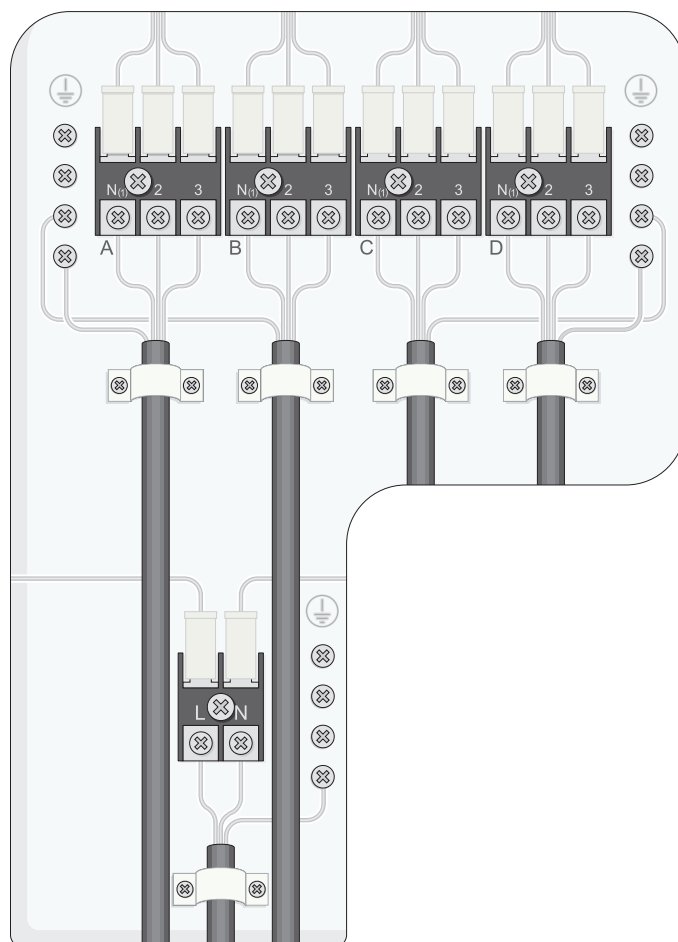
Electric connection to the outdoor unit 3-085 W4NO.
